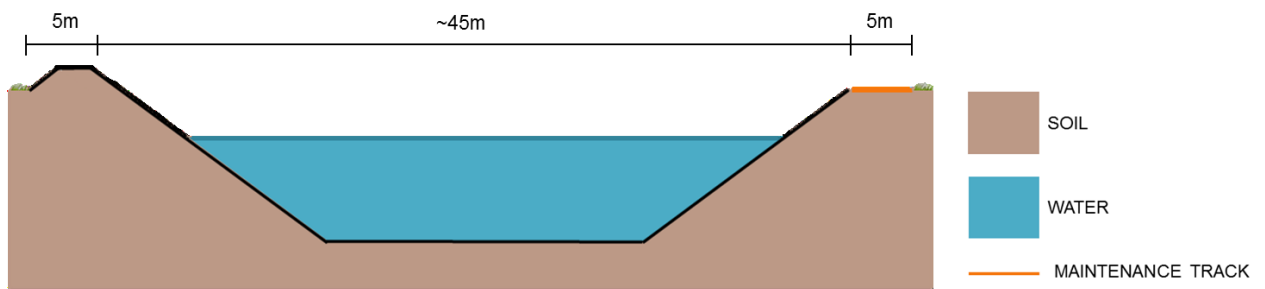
Typical cross-section of the flood relief channel through natural and made ground.
